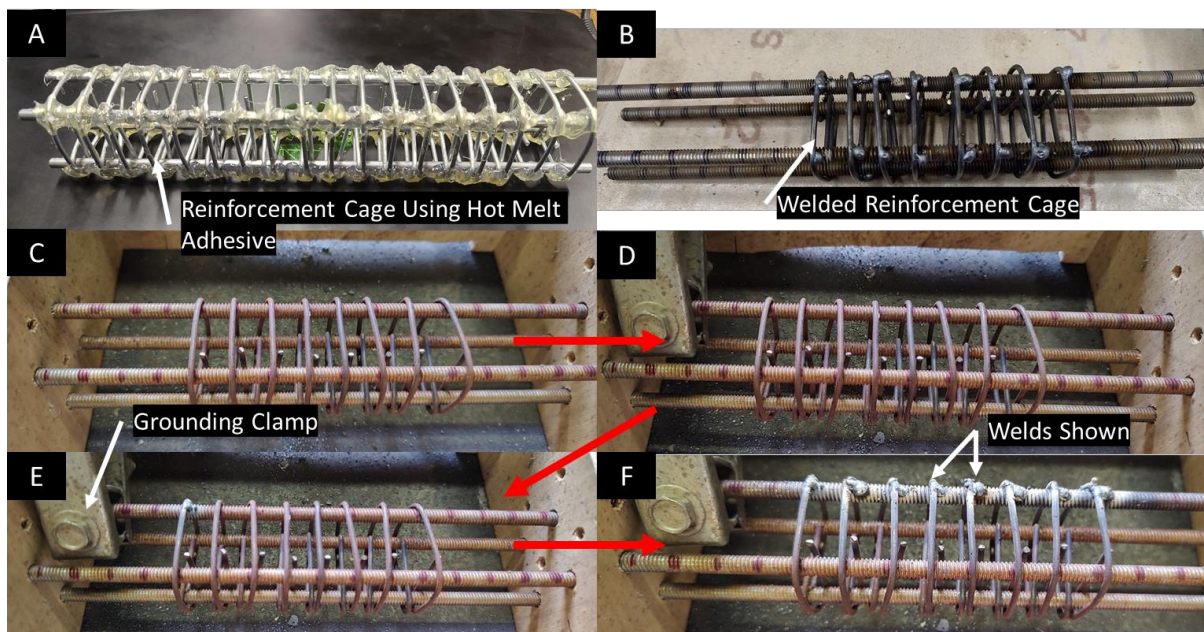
(A) An example of a wire cage manufactured with HMA as the fixture. (B) An example of a welded wire reinforcement cage after removal from the manufacturing jig. (C–F) The red arrows indicate the progression of steps of placing the shear reinforcement, sliding it into place, connecting the grounding wire for welding, and welding the shear reinforcement into place.
